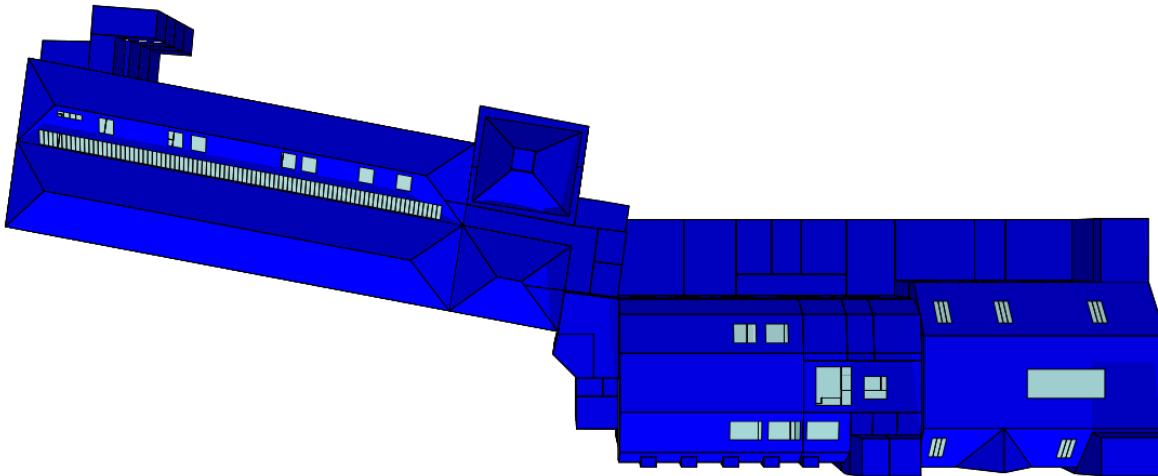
IES model geometry for Minto House, showing roof structure and glazing. Viewed in plan, from above.
